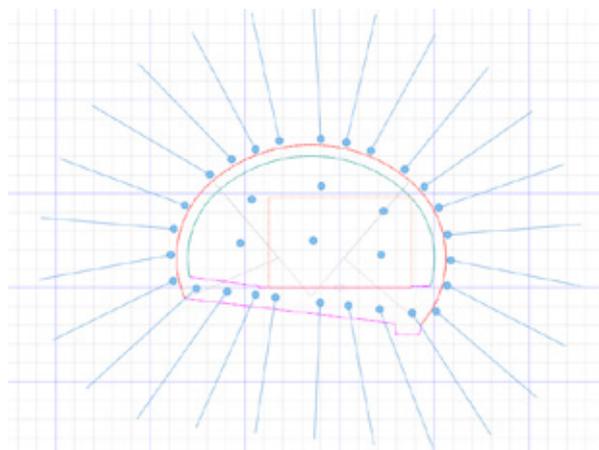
Drill plan for grouting and blasting. The grouting holes placement are adapted to the blasting holes (Bever Team 3).
